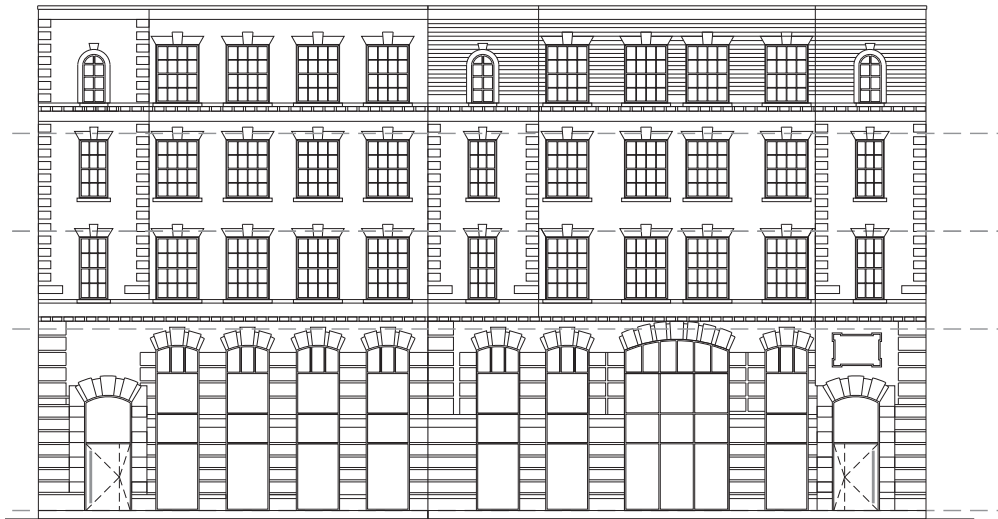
Preliminary proposed east elevation (Wallman Architects, 2022).
